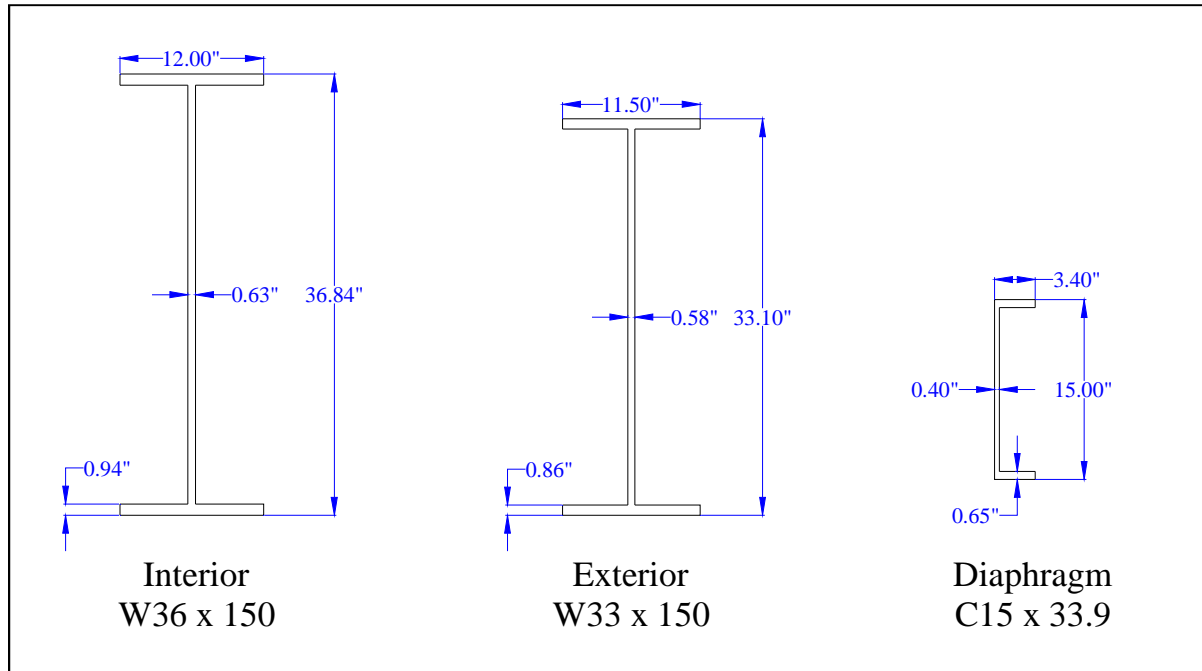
Schematic of field bridge girder and diaphragm member cross sections
